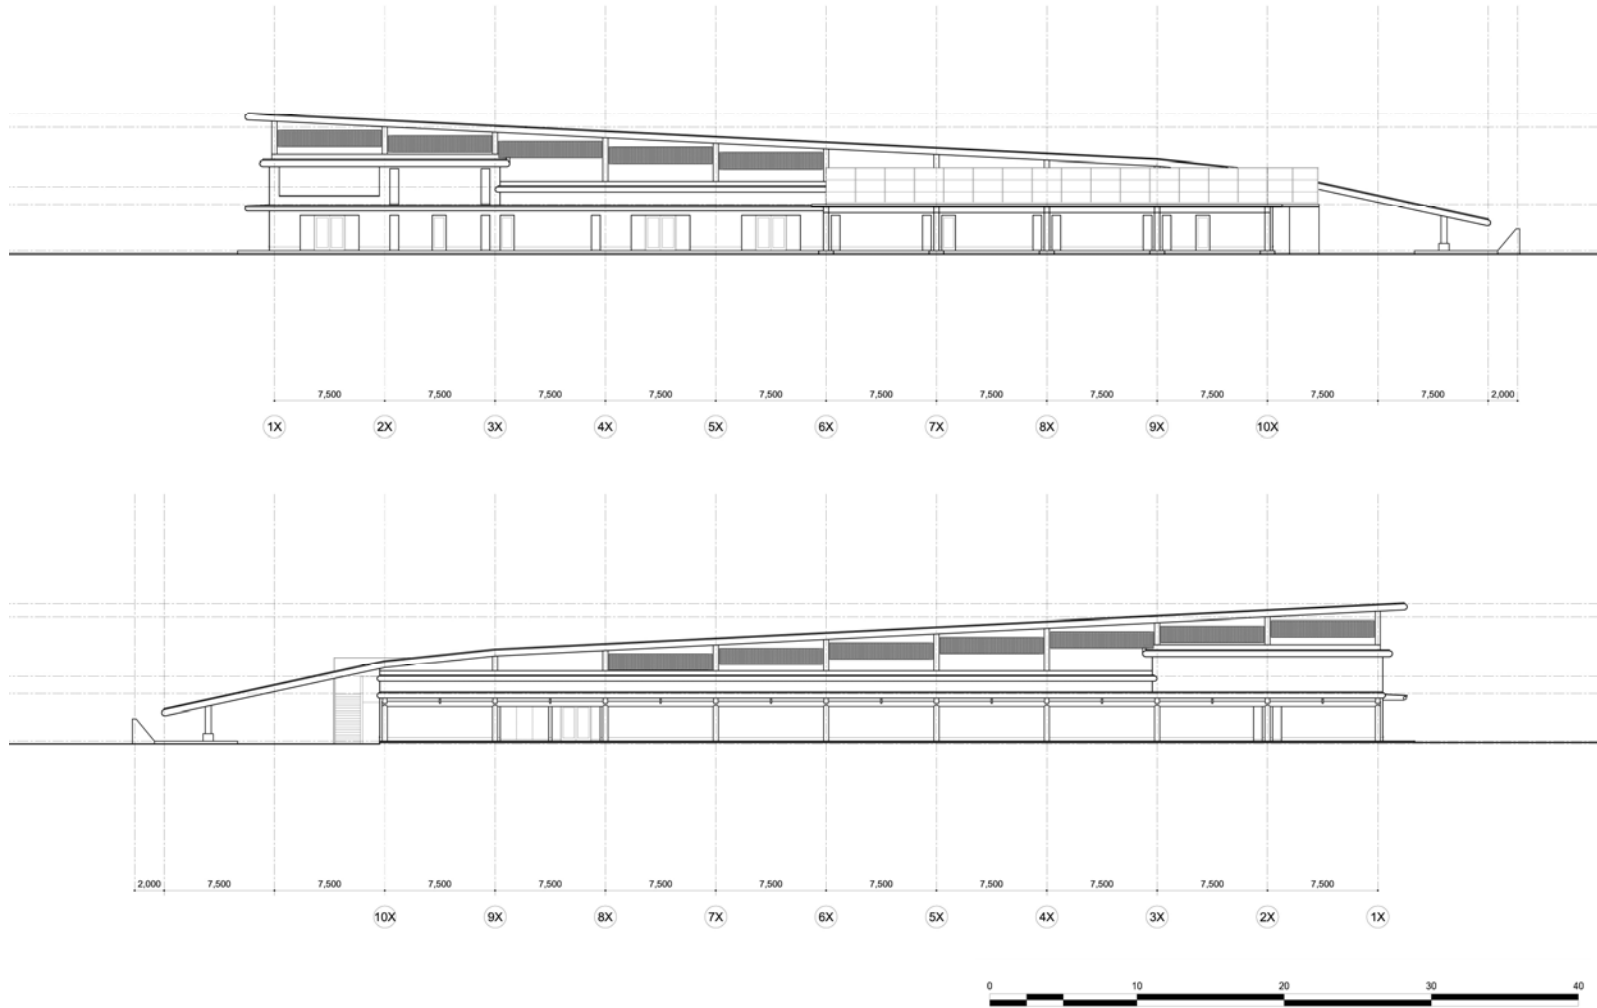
Elevation -1 (IDT) (Up: South side (Airside), Down: North side (Landside))
